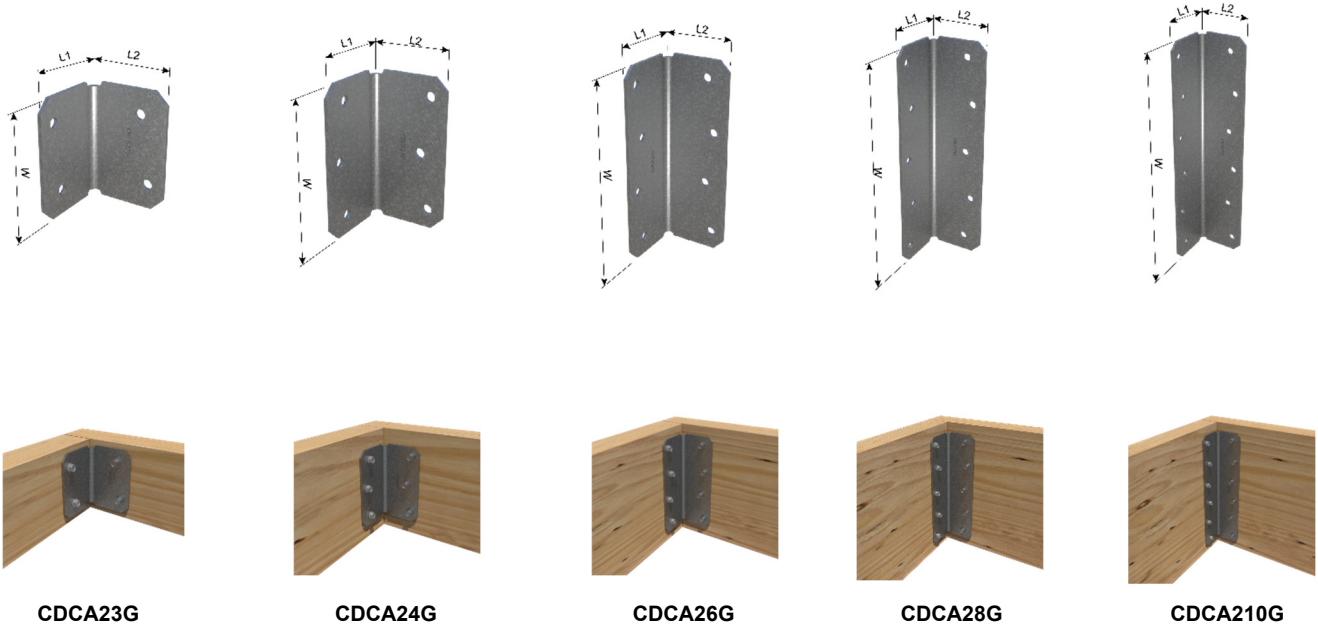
CDCA ANGLES AND TYPICAL INSTALLATIONS
